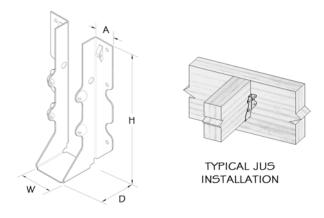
JUS SLANT NAIL JOIST HANGER
